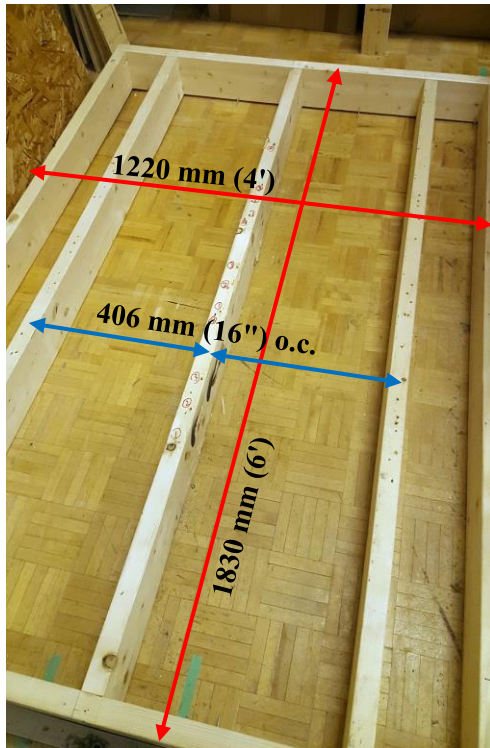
1220 mm x 1830 mm (4' x 6') backup wall framed at 406 mm (16") o.c. stud spacing and secured to concrete floor with L-angles.
